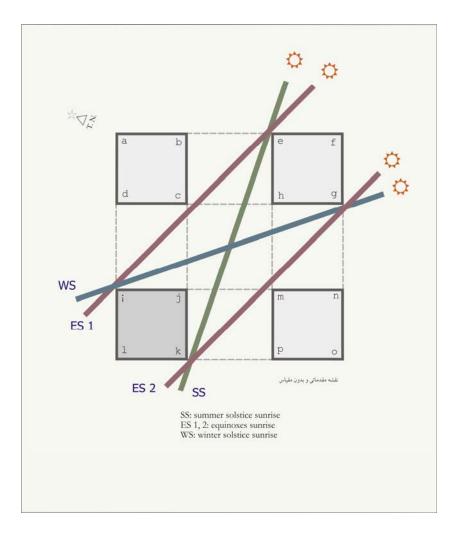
The floor plan and sightlines of Khaneh-e Div Tetrapylon
